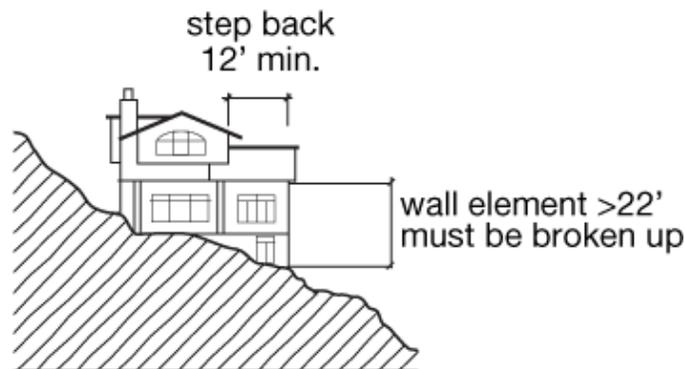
Natural Resource Protection, Hillside Protection, Building Wall Elements
